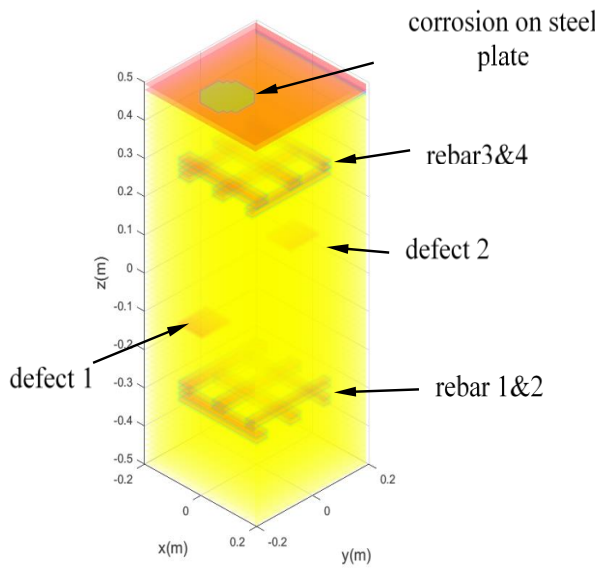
15 Reinforced concrete wall of a reactor, rebar and damage distribution
